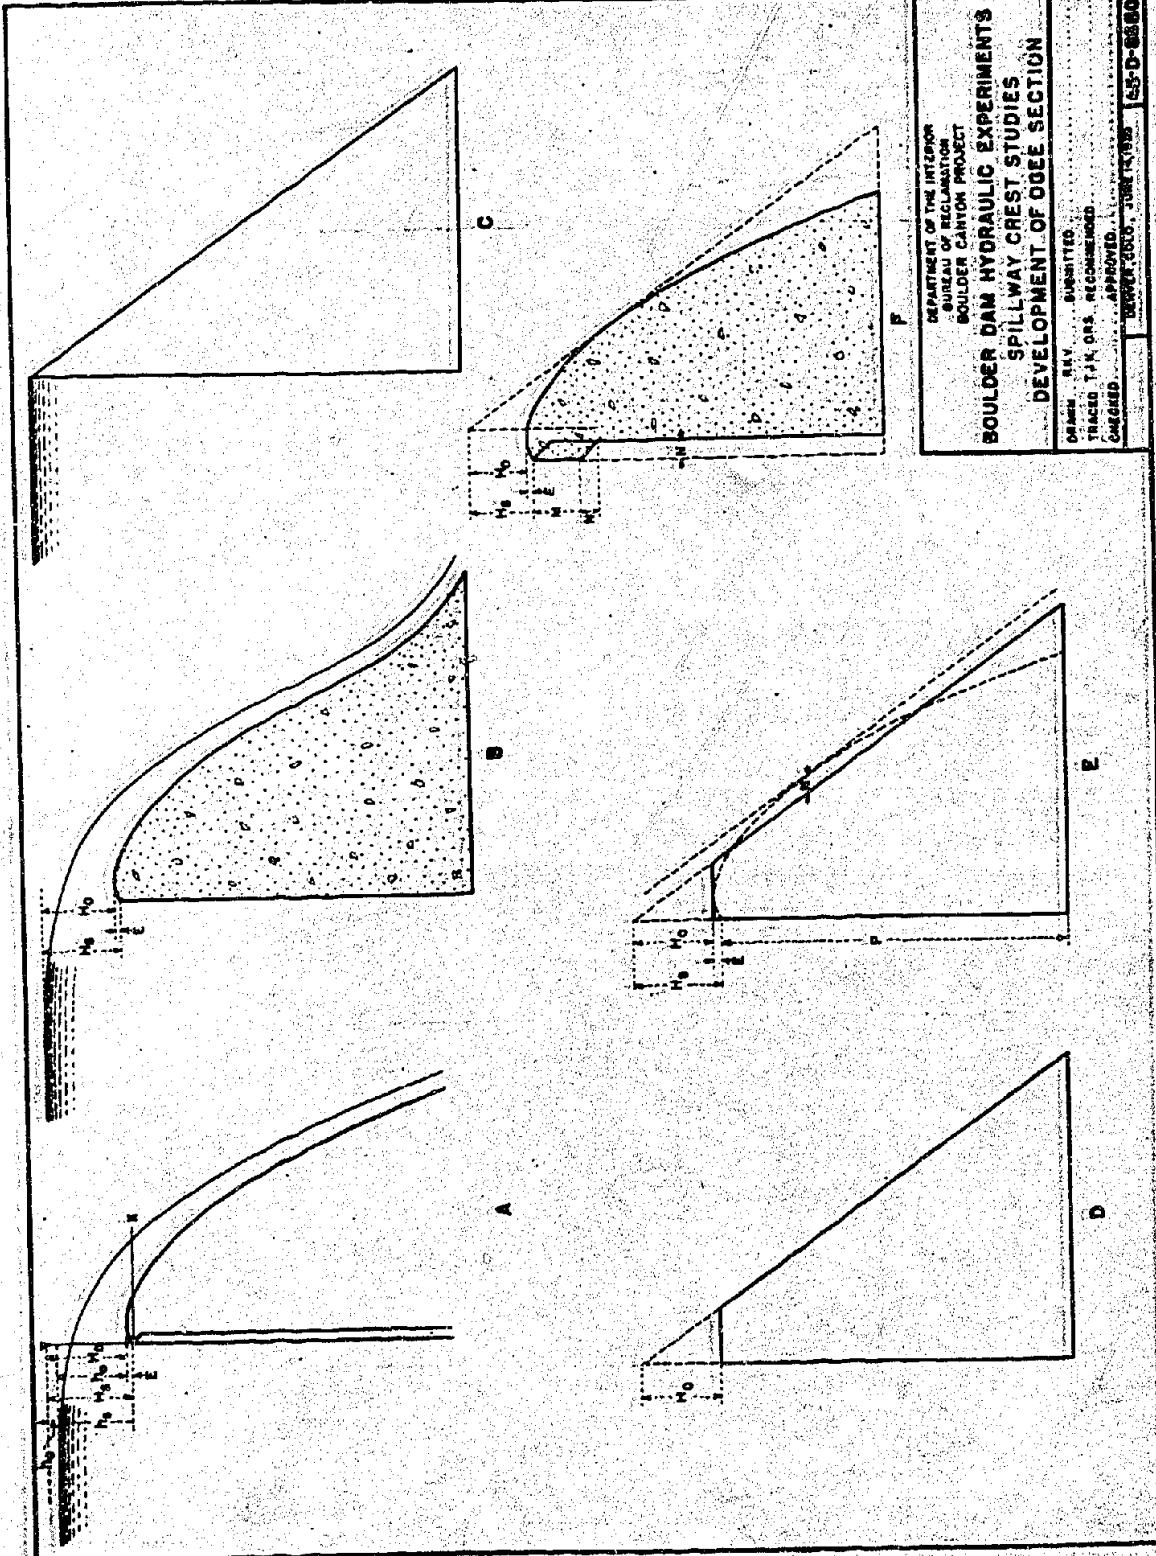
DEVELOPMENT OF OVERFALL CREST SECTION
